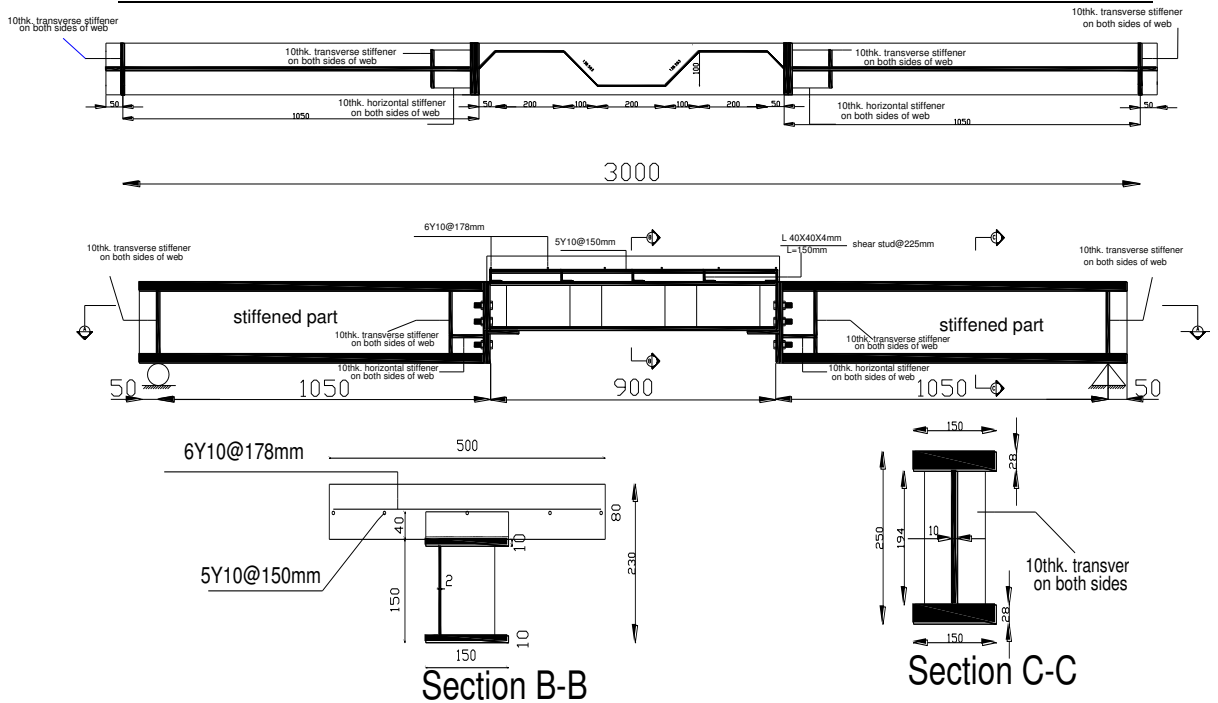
Details of test specimens B1 and B2 (all dimensions are in mm)
